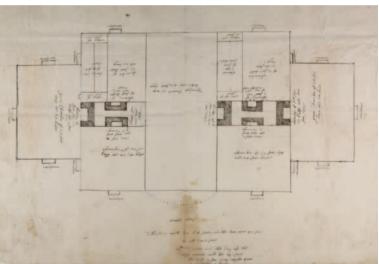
First floor plan for house with flanking wings. Possibly a preliminary proposal for Lamport Hall. (*Kent History and Library Centre, U1015 E3*)
